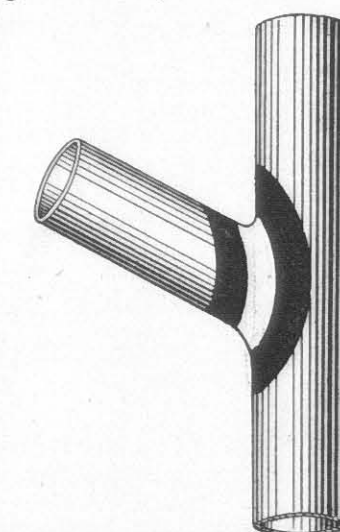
Wiped Branch Joint of quicker Pitch.
